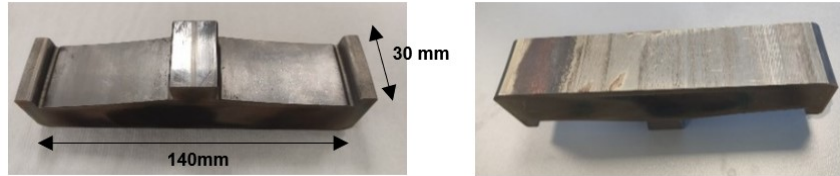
Lateral and top view of a segment obtained from the corroded bearing, Bearing B.
